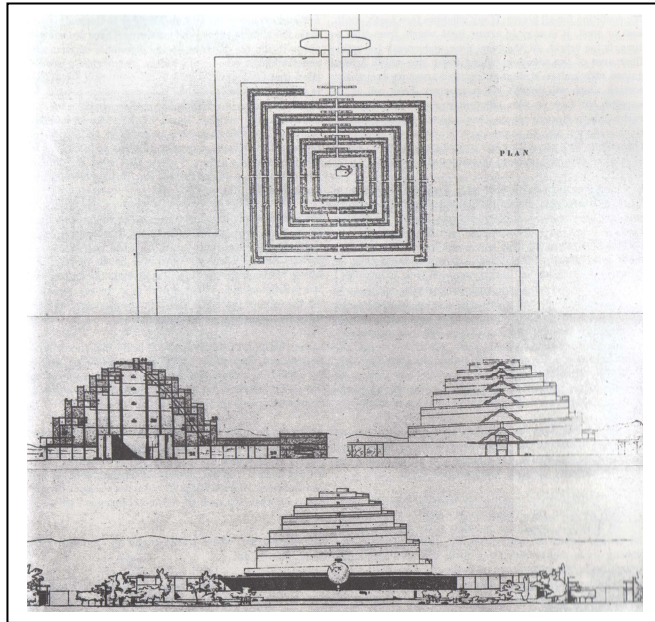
Mundaneum, Geneva, Le Corbusier and Pierre Jeanneret, architects, 1929. Plan, section and elevations. (Source: Hays, 1998), p: 609.
